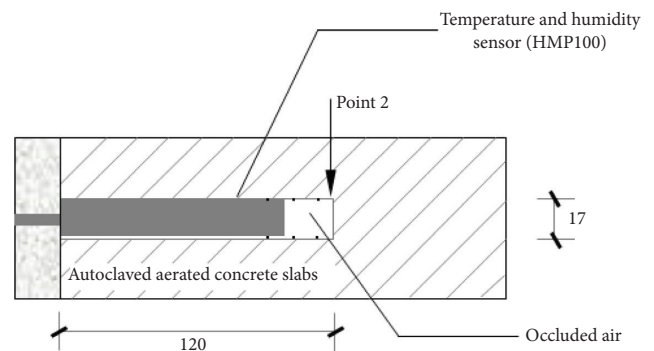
Installation method for sensors inside autoclaved aerated concrete slabs (/mm).
